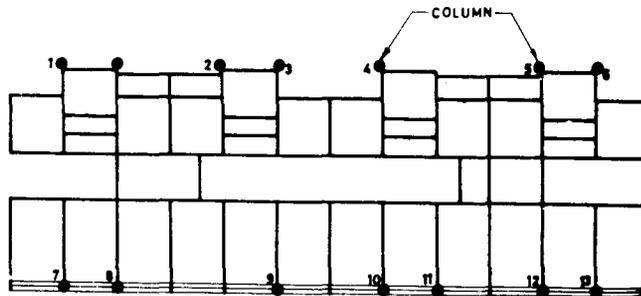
GROUND FLOOR PLAN BUILDING- K 2
